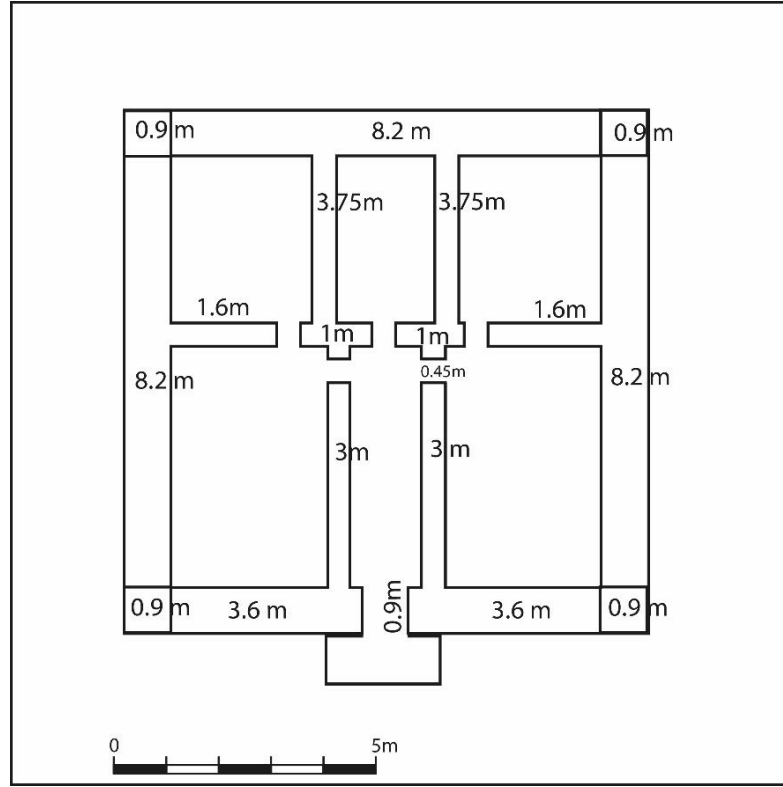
A House Plan from Kocayaka (*Illustrated by M. Çarkı*)
